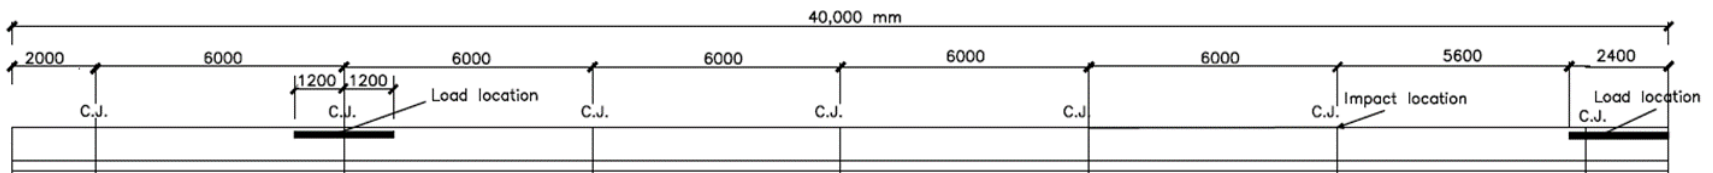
Elevation of the barrier wall showing location of crash test and static tests
